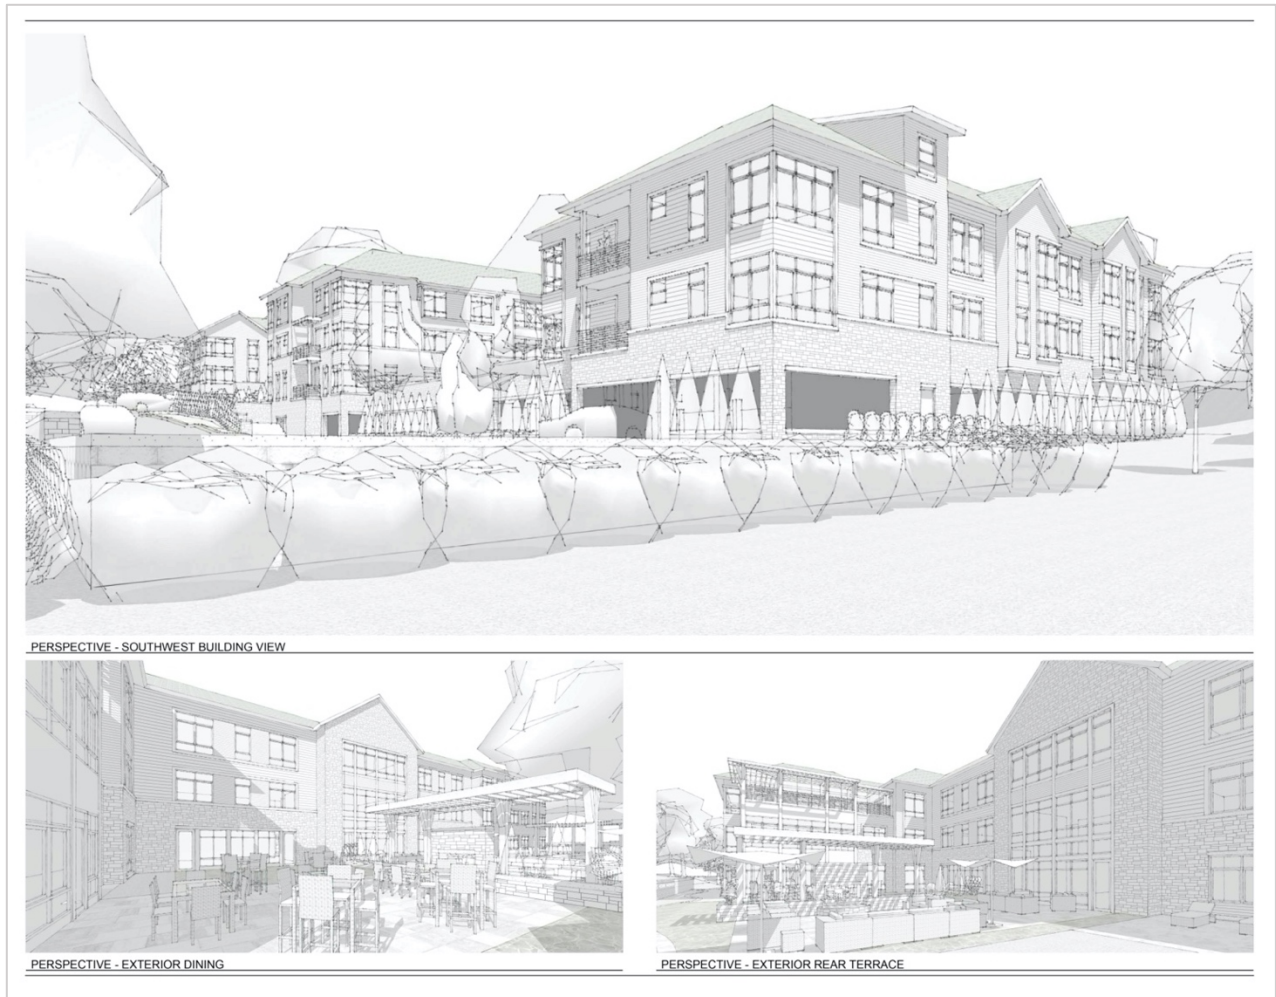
Perspective elevation of southwest building view, exterior dining, and rear terrace.
